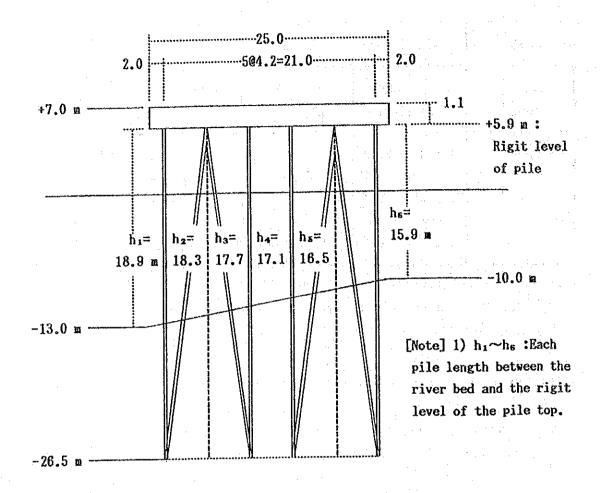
Assumed Structural Dimensions of Timber Wharf at Tg. Sebubal
